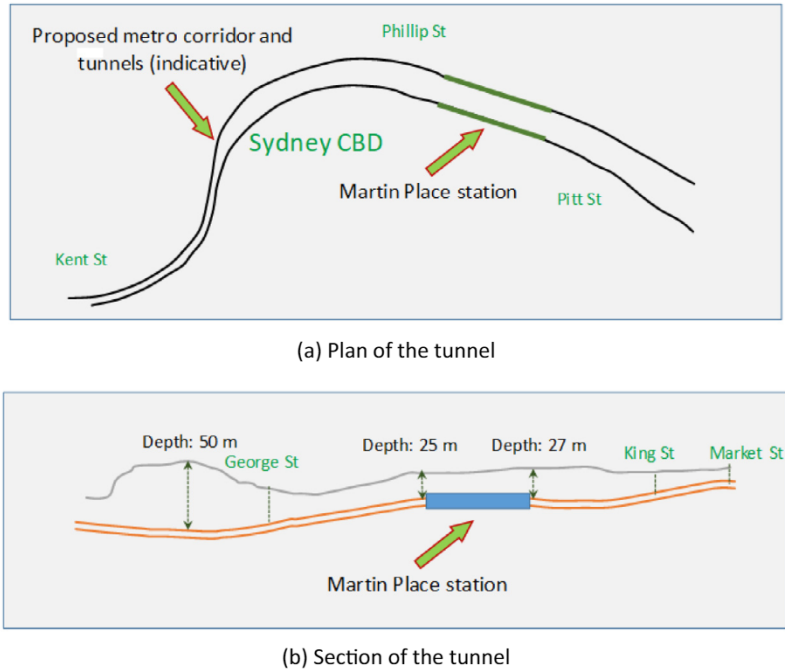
Proposed tunnel alignment and station platform in Martin Place, (a) plan and (b) section (data taken from Metro, 2016).
